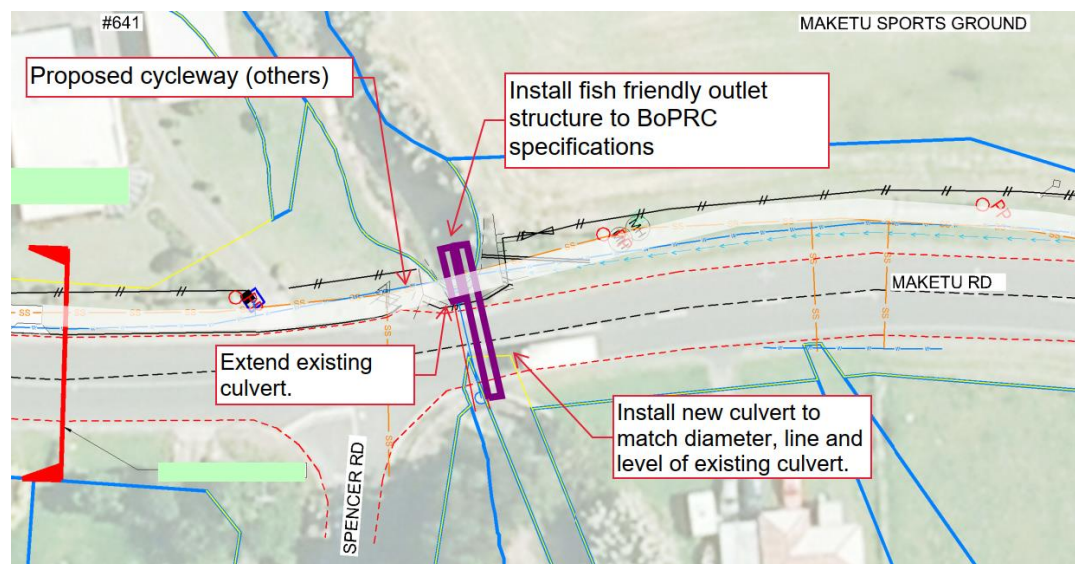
Sketch of Proposed Works for Otumakoro Stream Culvert Upgrade
